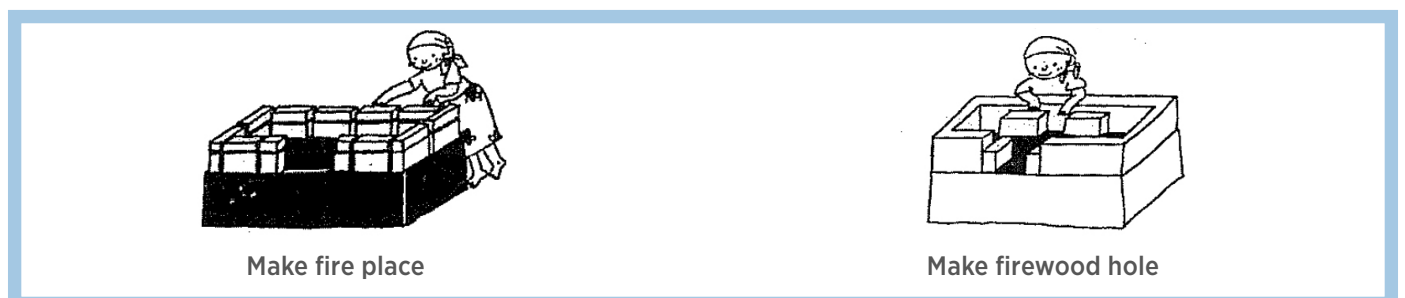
Placing bricks and plastering to make a Kamado Jiko stove
